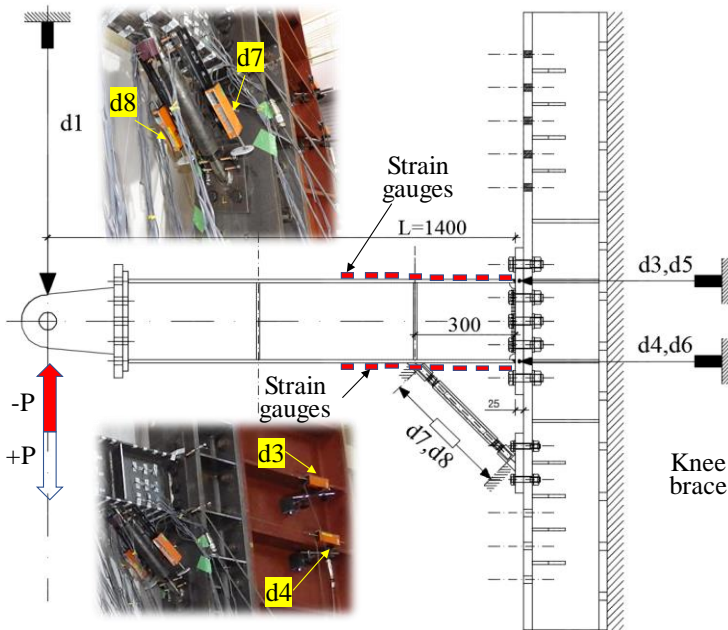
Apparatus and geometry of the full-scale test specimen
